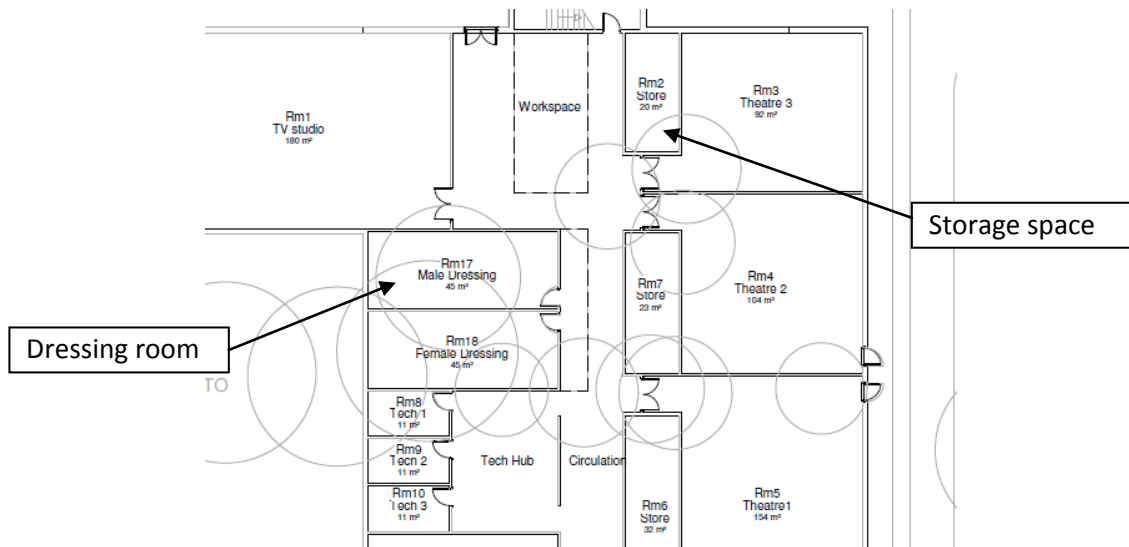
Plan detail showing the area and location of storage spaces and dressing rooms³⁸
